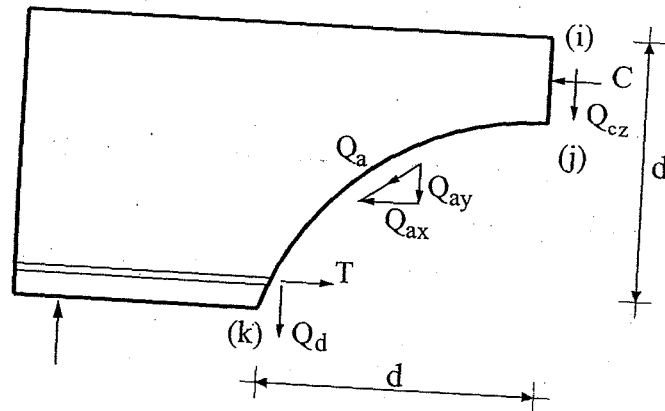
Internal forces in a cracked beam without stirrups
